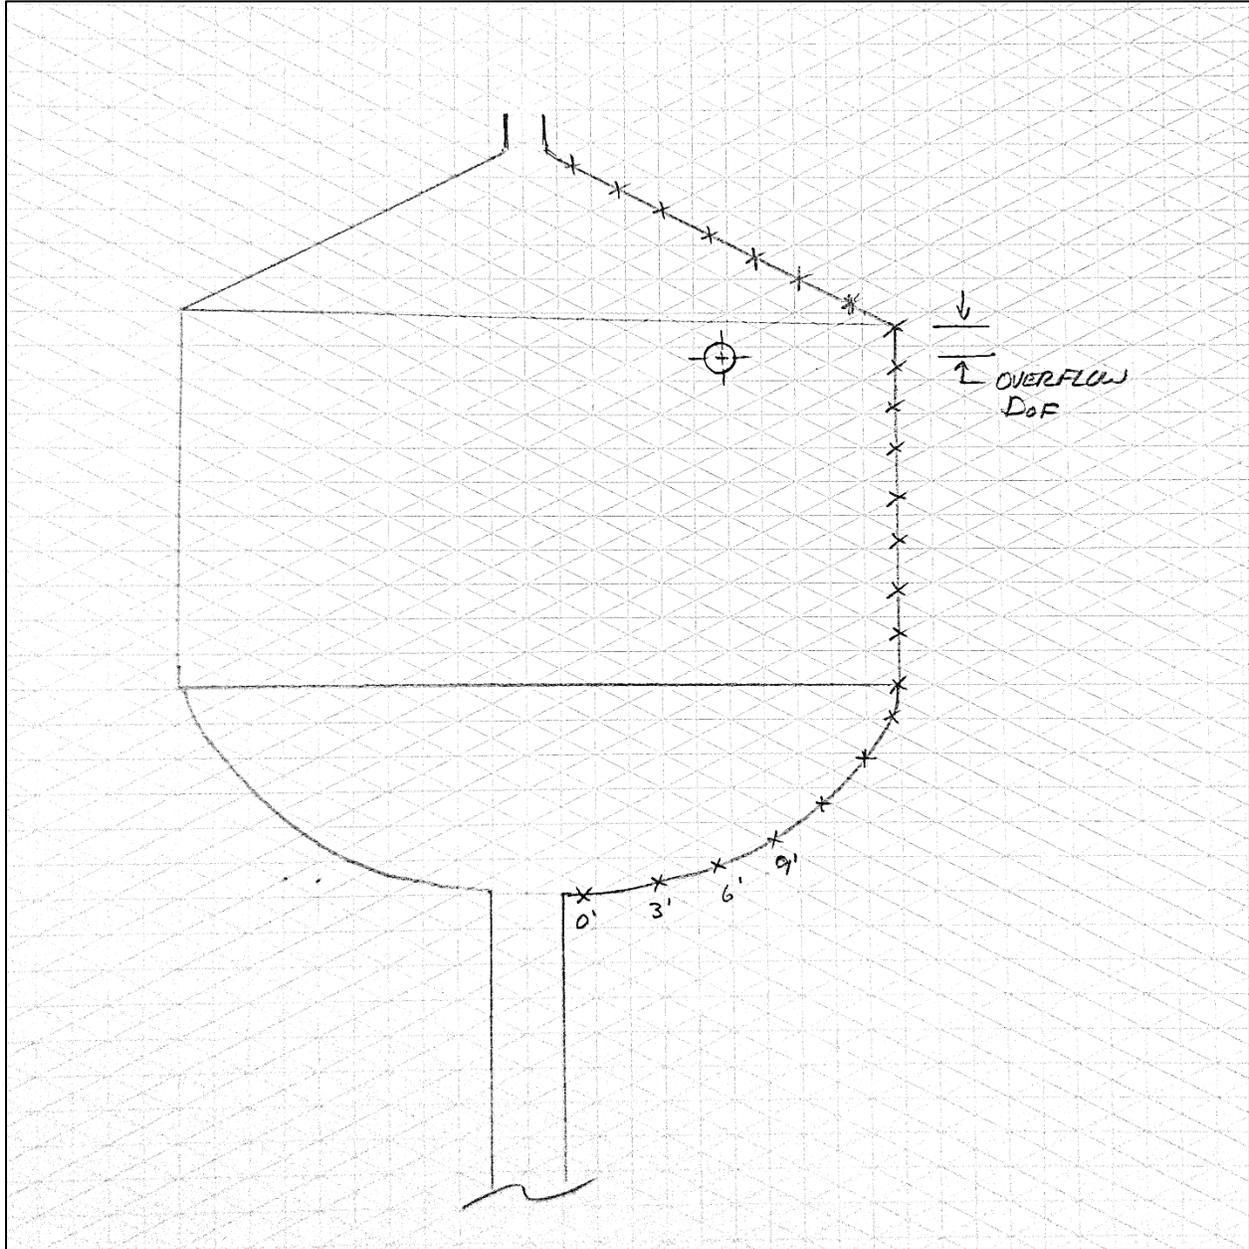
Shell and roof UT spacing – sketch not to scale. Test locations to include N, S, E, and W locations. Overflow piping location (unknown) to be recorded from the roof to shell connection. Sketch is simplified to exclude support legs, walkway, and other appurtenances.
